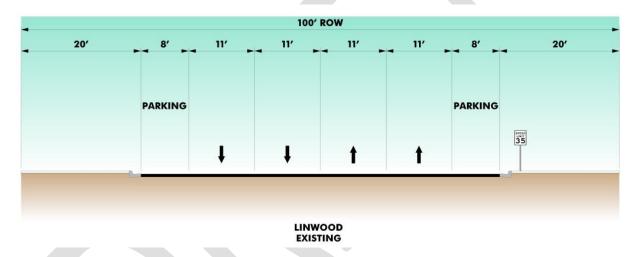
Bus Rapid Transit Linwood Blvd Typical Section, Existing Conditions
